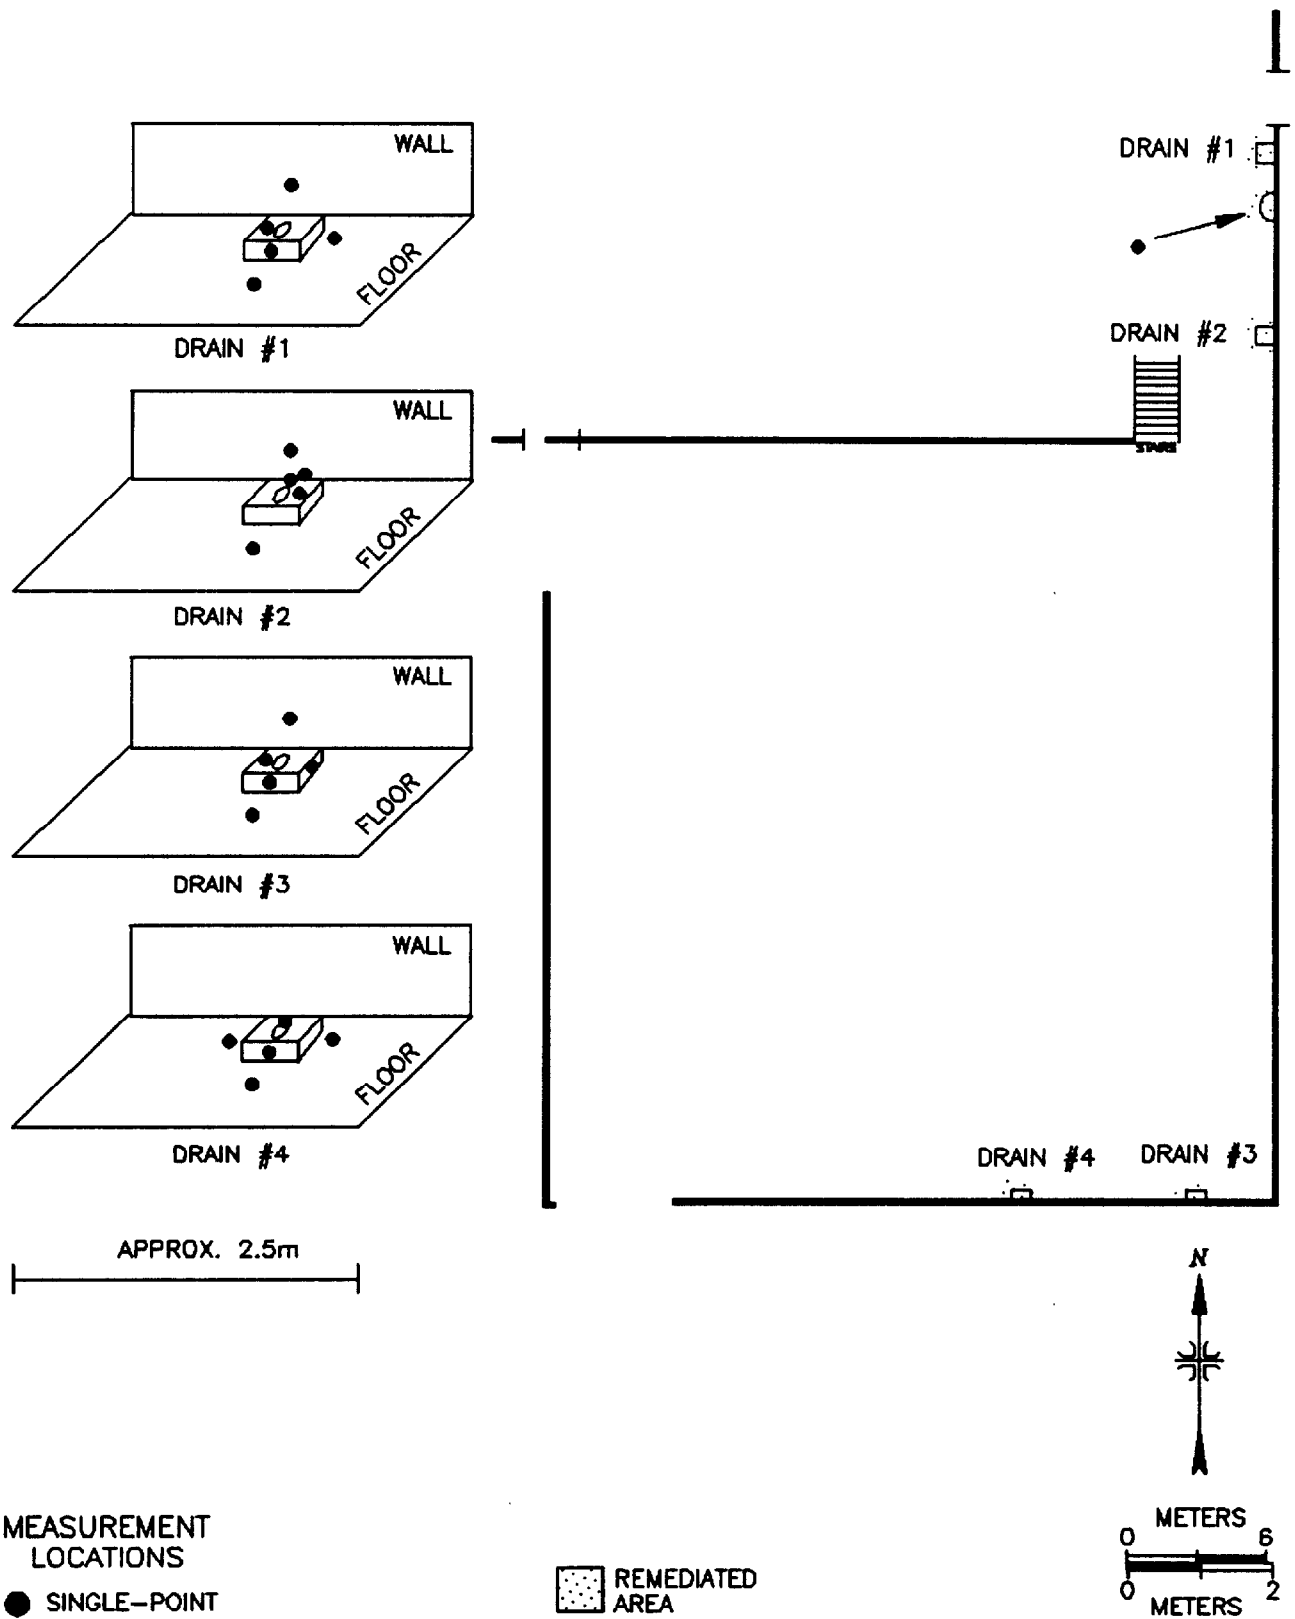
Building 29, Room 111 Floor, Lower Walls, and Drain Pedestals – Remediated Areas and Measurement Locations
